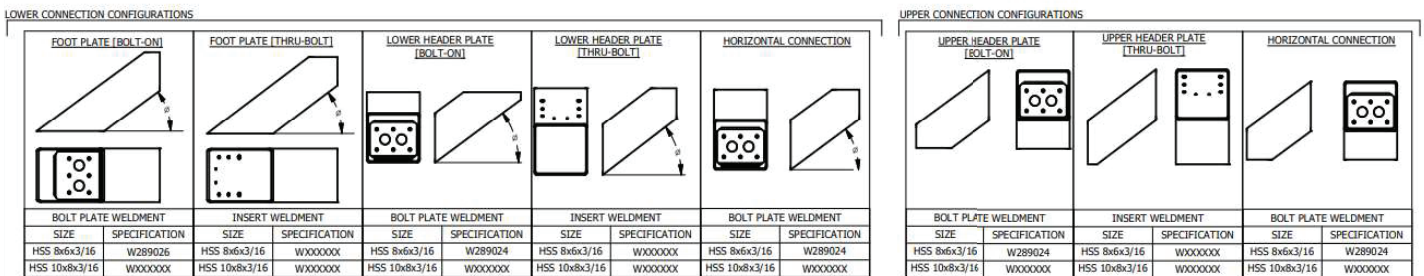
BOLT PLATE/BOLT PLATE WELDMENT (HSS 8x6x3/16)
